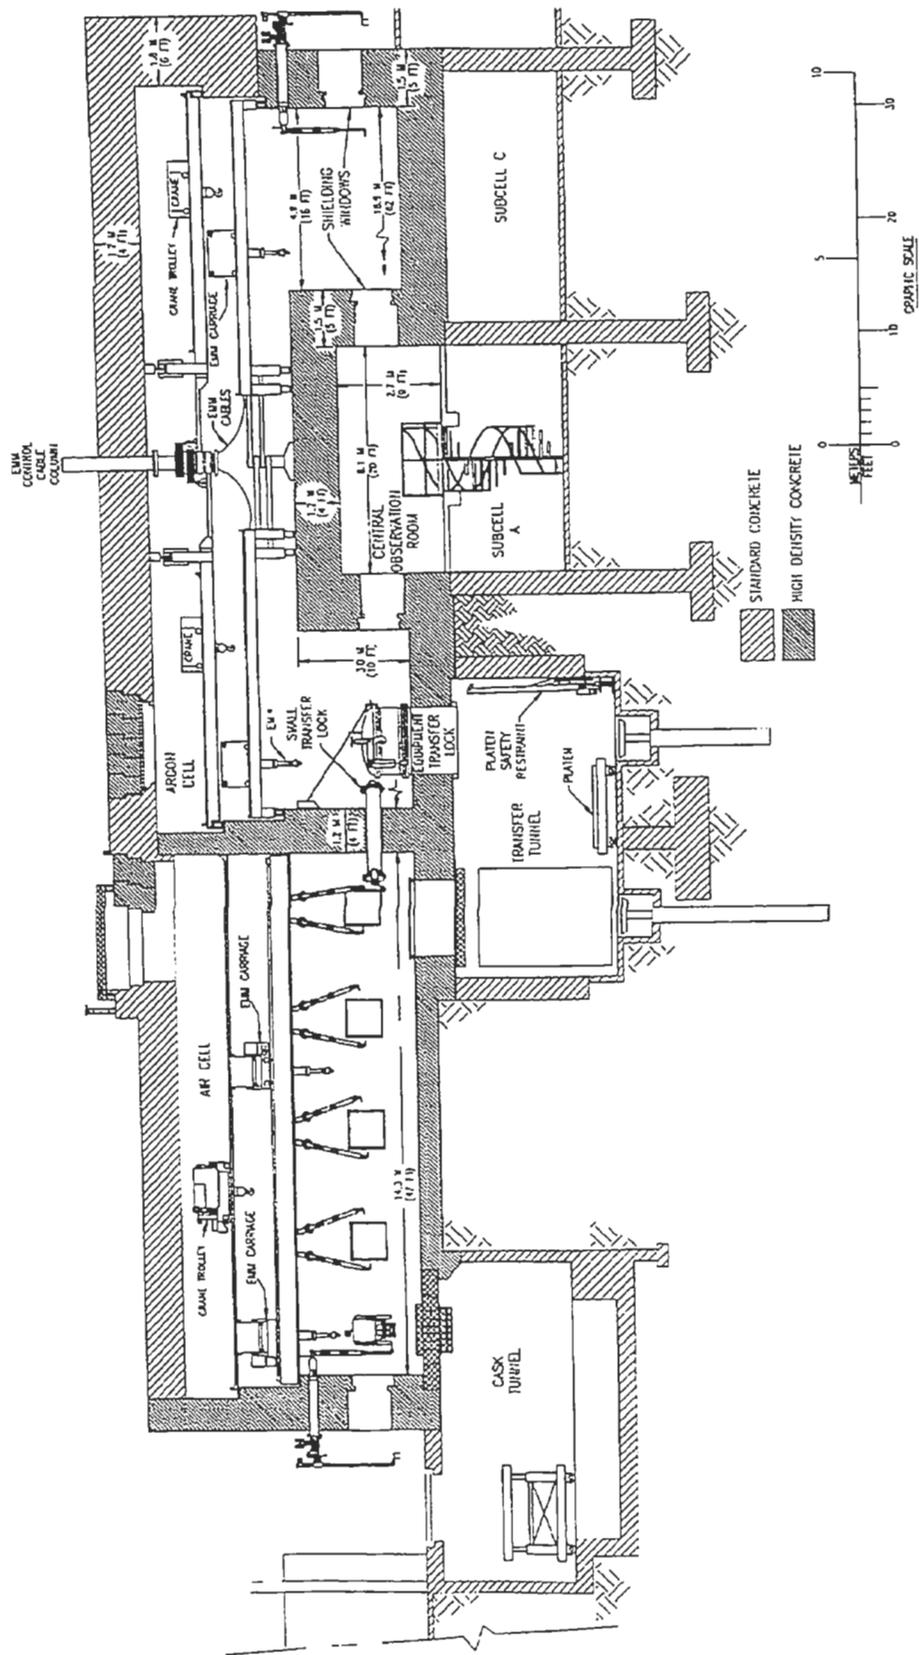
East-west elevation cross section of the FCF, showing the argon cells and basement area.
